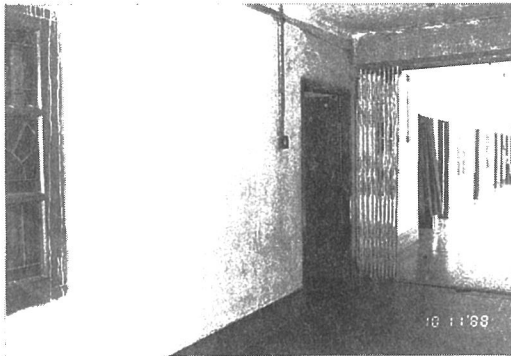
A reinforced concrete shear wall positioned within the ward longitudinally, Dharan Hospital, Dharan Bazaar, Nepal
